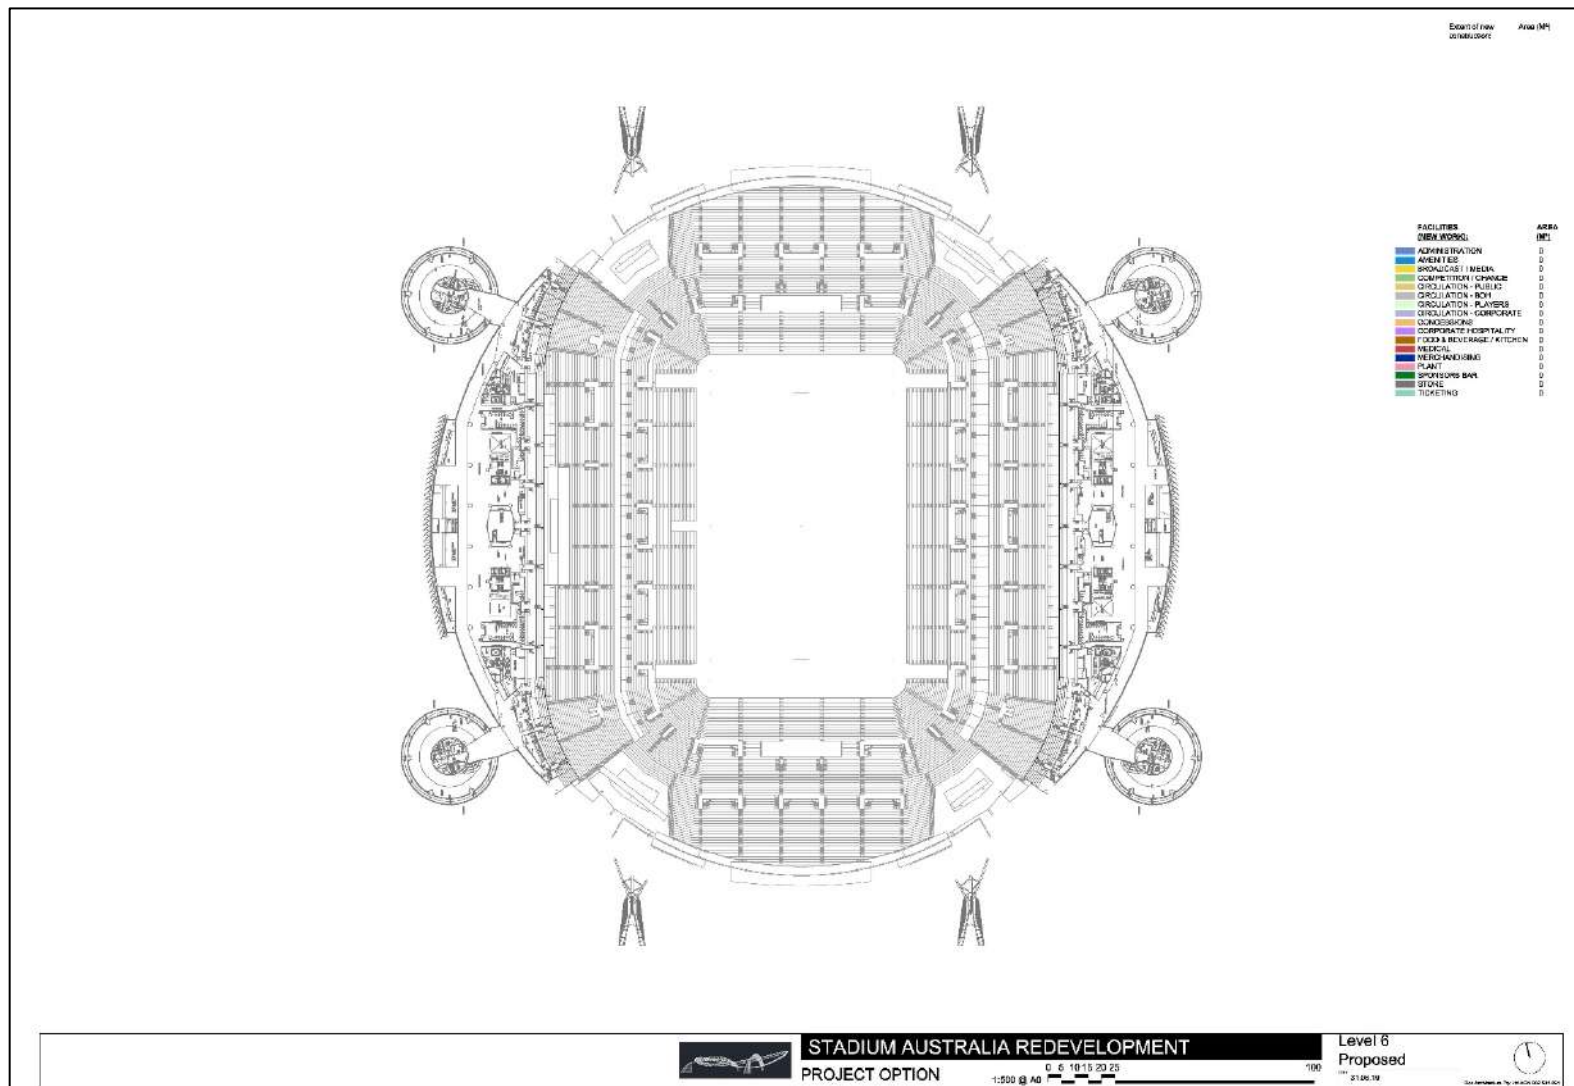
Proposed Level 6 Plan (Source: Cox, 2019)
